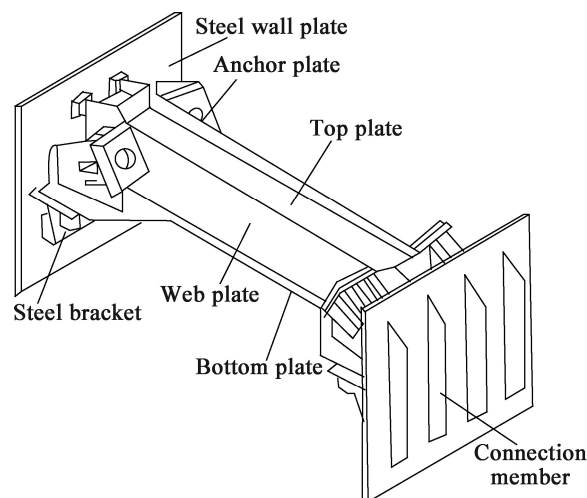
Schematic structure of the combination of steel anchor beam and steel corbel
